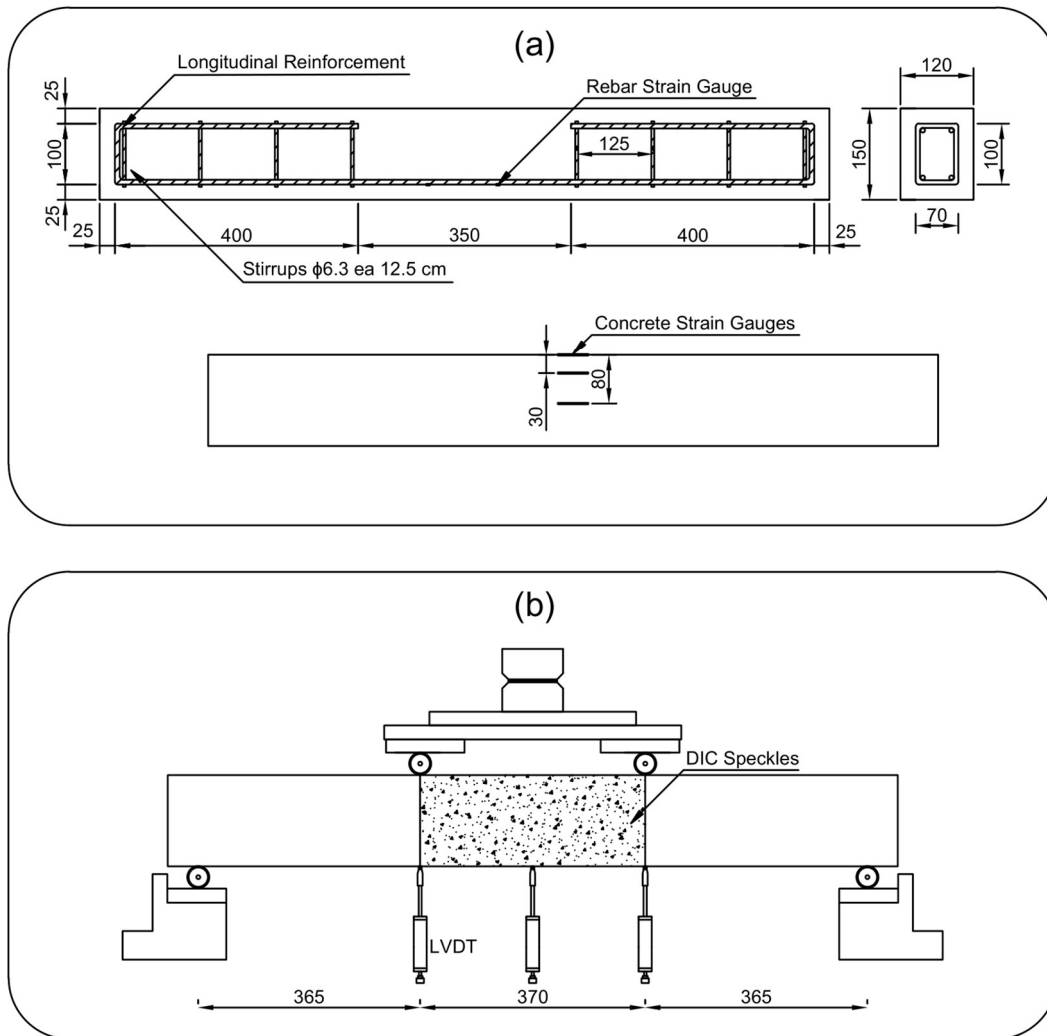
Structural tests setup illustration: (a) beam reinforcement configuration and strain gauge positions and (b) tests setup with LVDTs disposal. Dimensions in mm.
